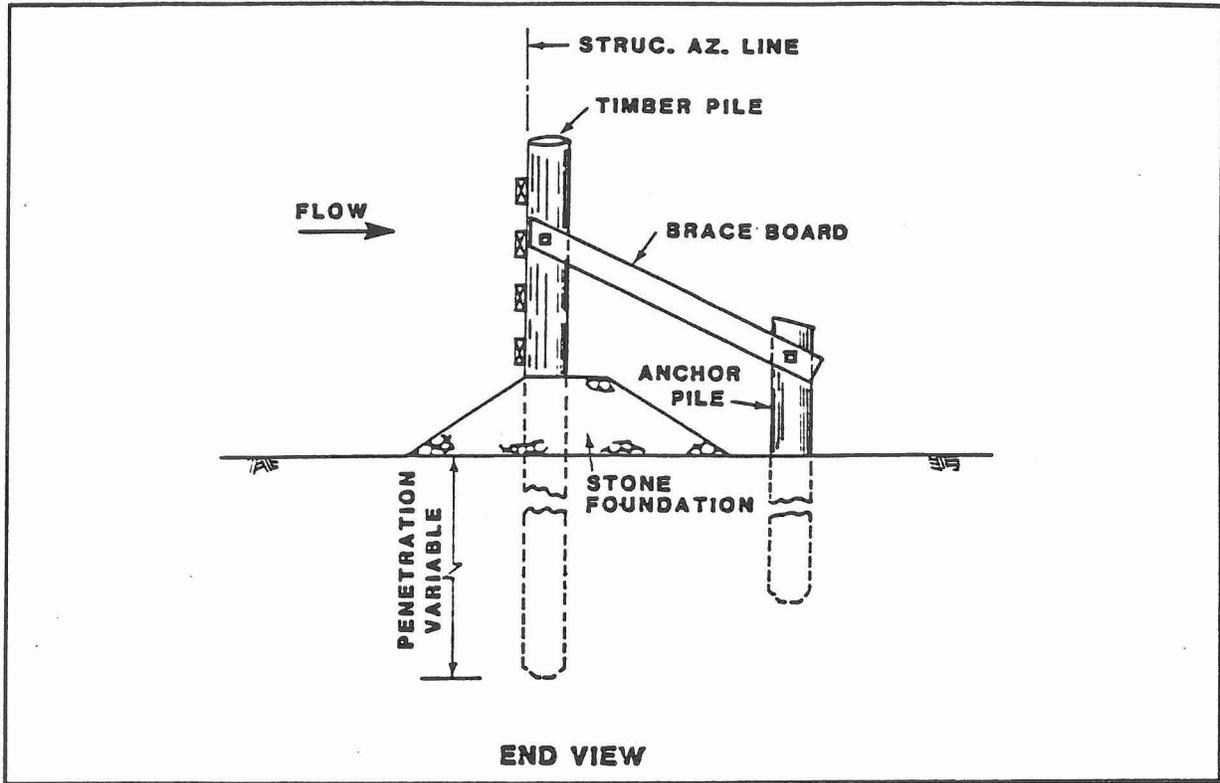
Typical wood fence retarder structure (Modified from U. S. Army Corps of Engineers, 1981; After [37]).
